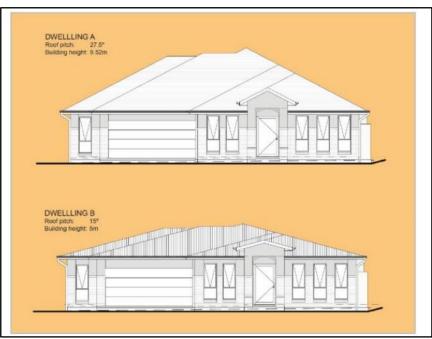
Dwelling roof forms, 15 degree and 27.5 degree roof pitches
